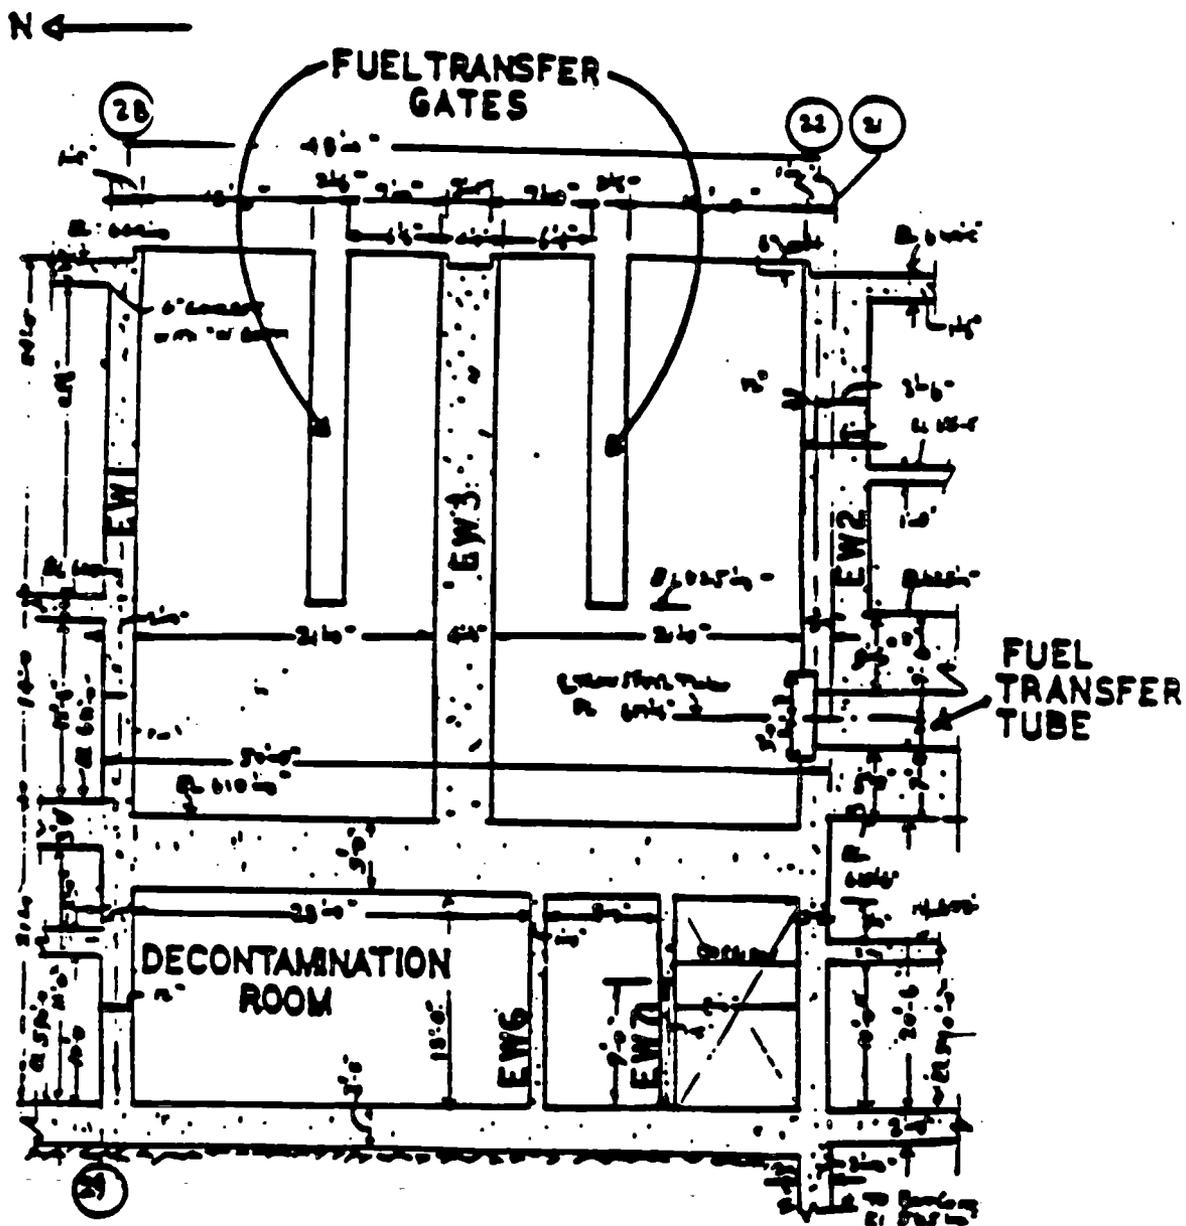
Section C-C - Elevation 590 ft to 649 ft
